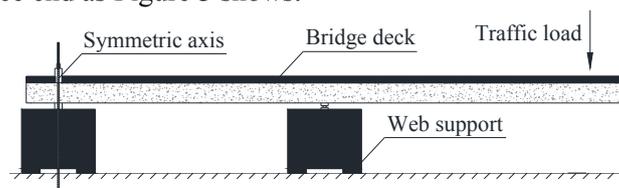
Sketch of the test setup based on a real top deck slab of a highway concrete box-girder bridge.
